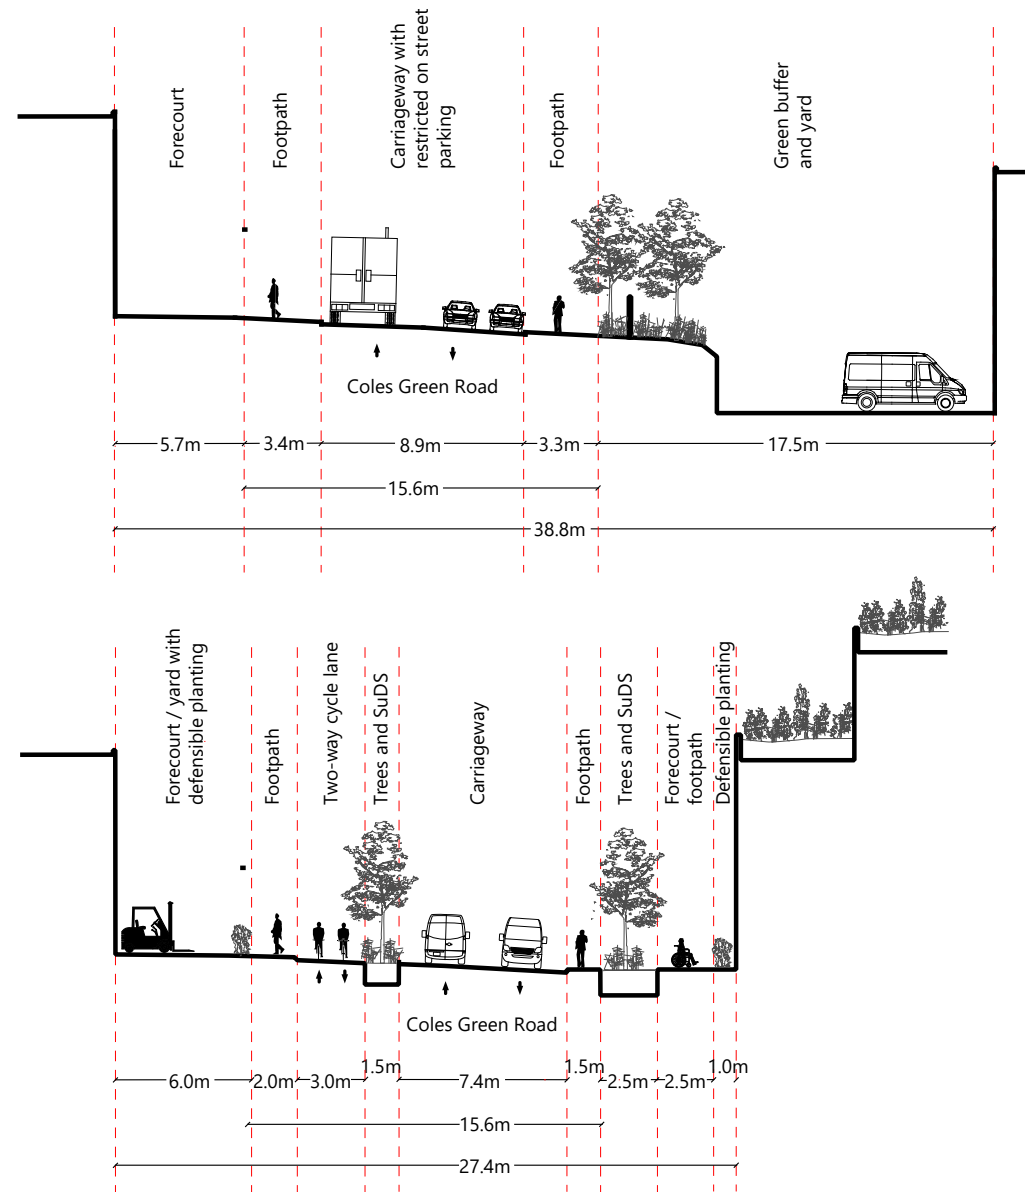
Existing and aspirational sections through Coles Green Road (north)
